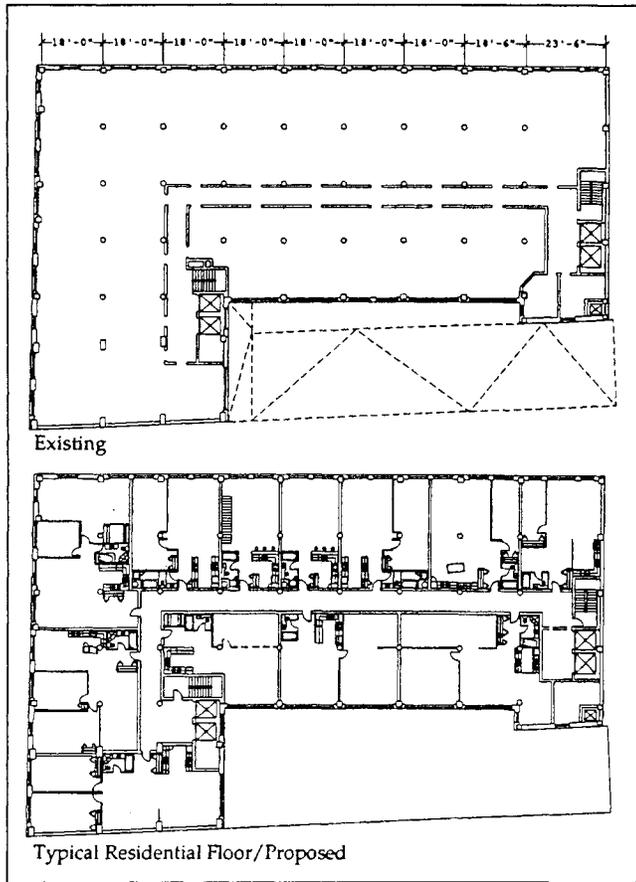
Upper Floor of Mayor Building—Existing (Top) and Proposed (Bottom) Plans for Typical Residential Floor
